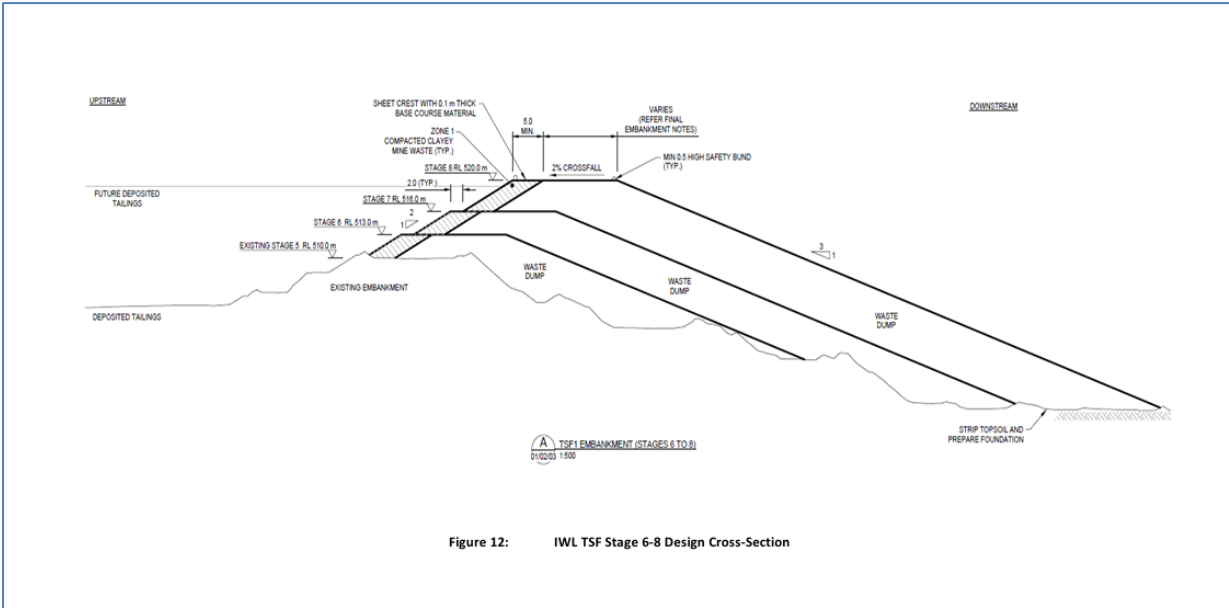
IWL TSF Stage 6-8 Design Cross-Section
